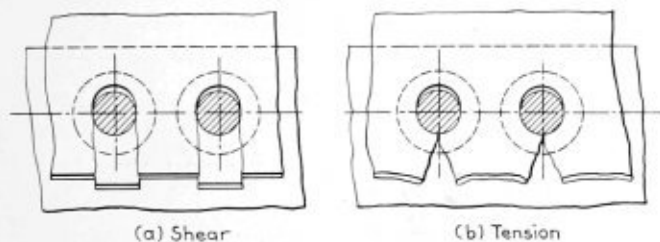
Failure of Plate in Front of Rivets
